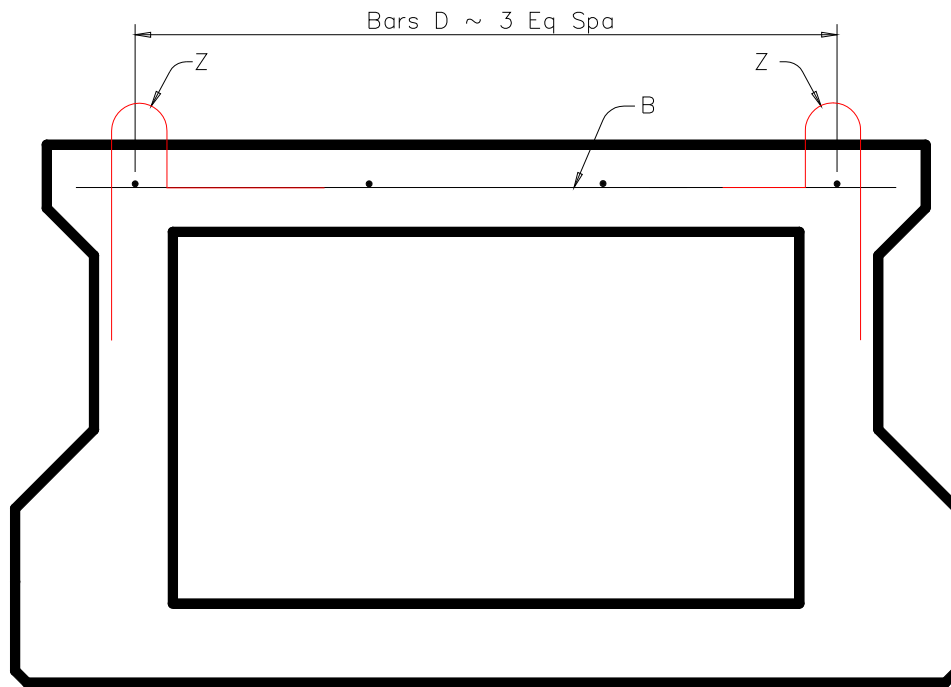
Recommended Longitudinal Flexural Reinforcement in Future PSFC Box-Beams
